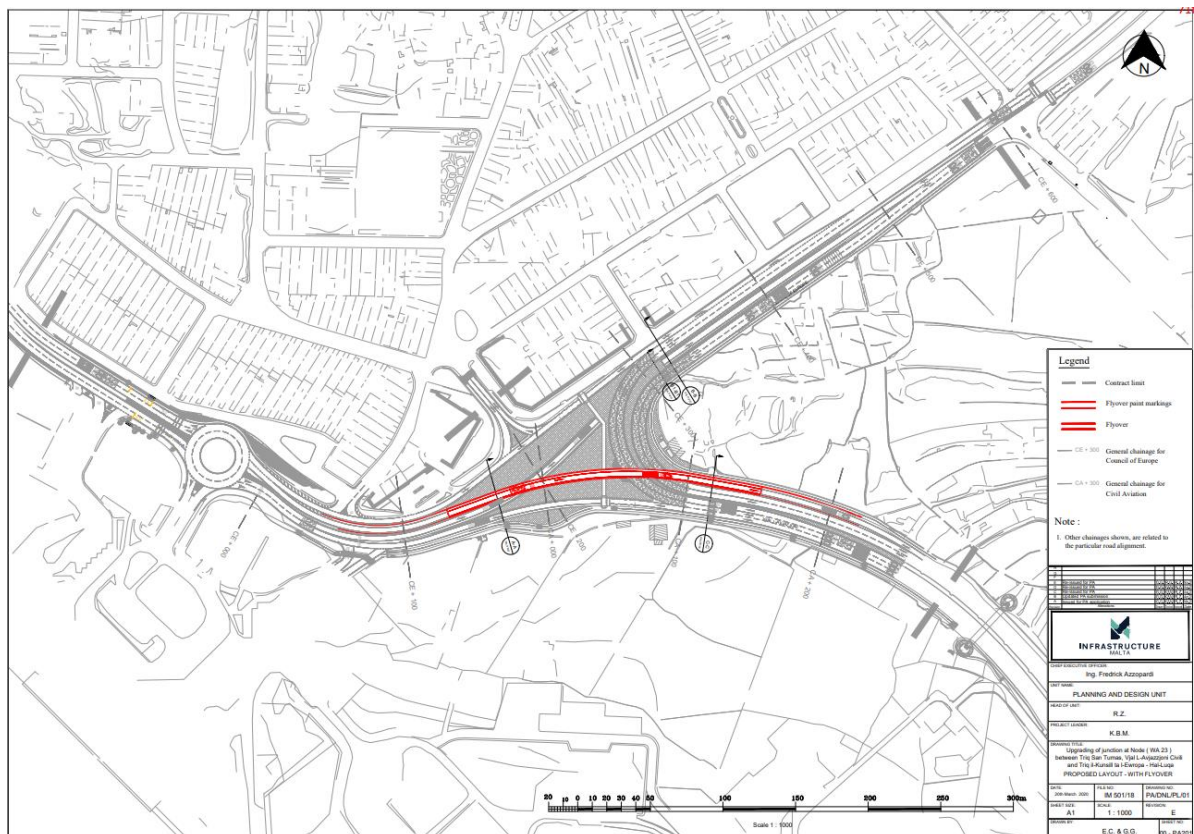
ii: Proposed overpass (flyover) (Source: PA/04721/20 – 71f on EApps)
